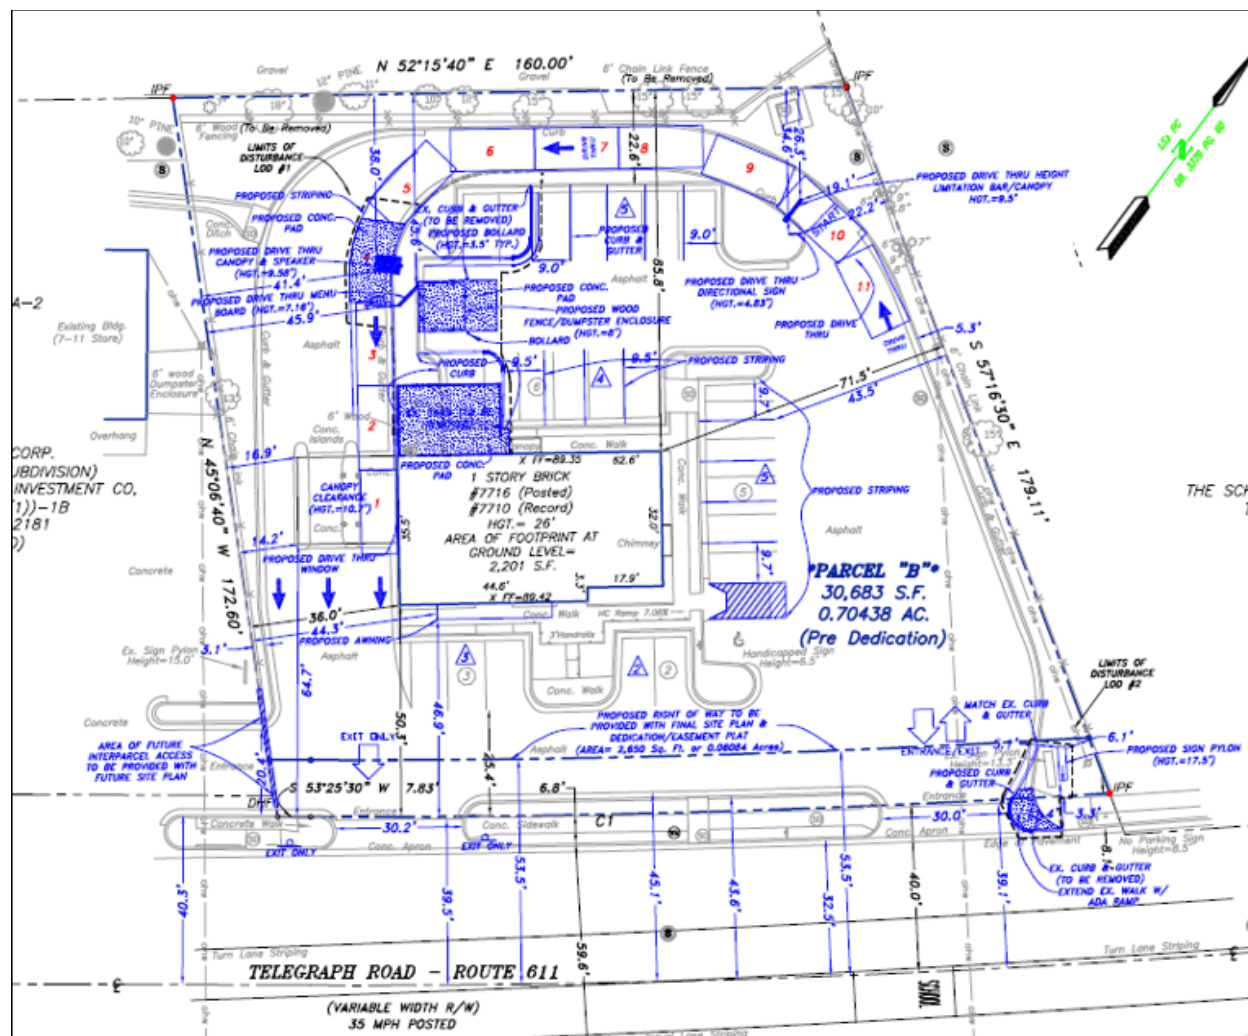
Site Layout, Source: SE Plat, Sheet 2
